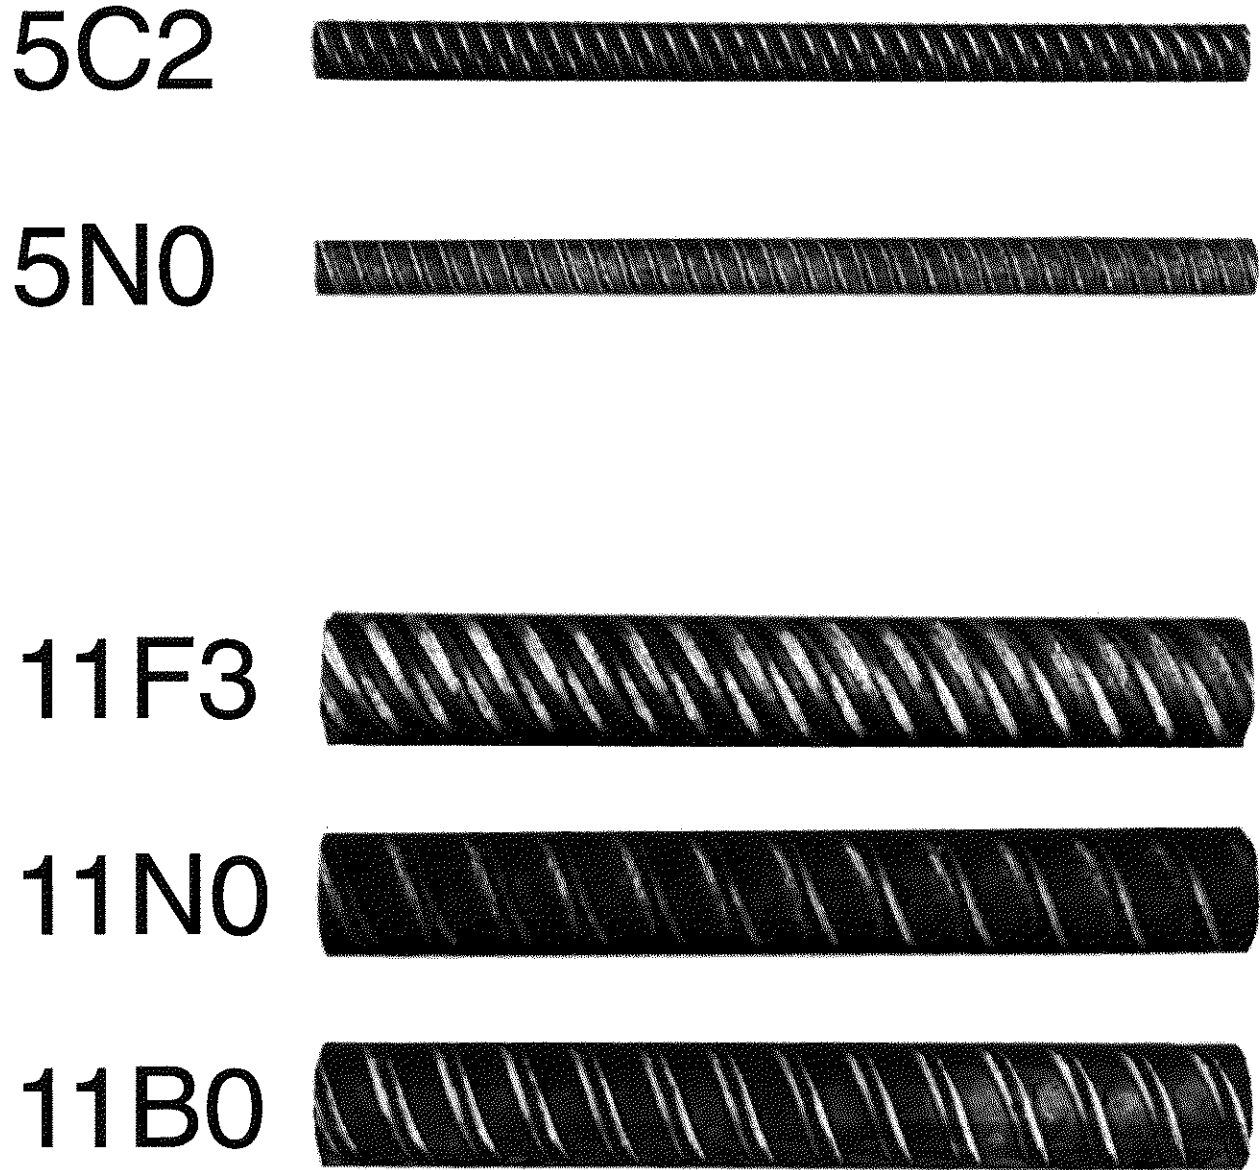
Reinforcing bar deformation patterns, No. 5 and No. 11 (16 and 36 mm) bars
